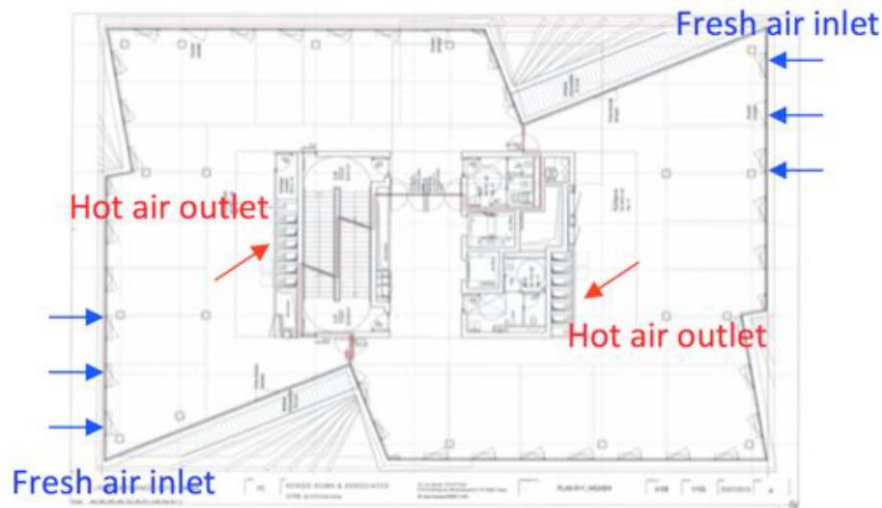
22 - Natural ventilation flow in the HIGASHI building.
